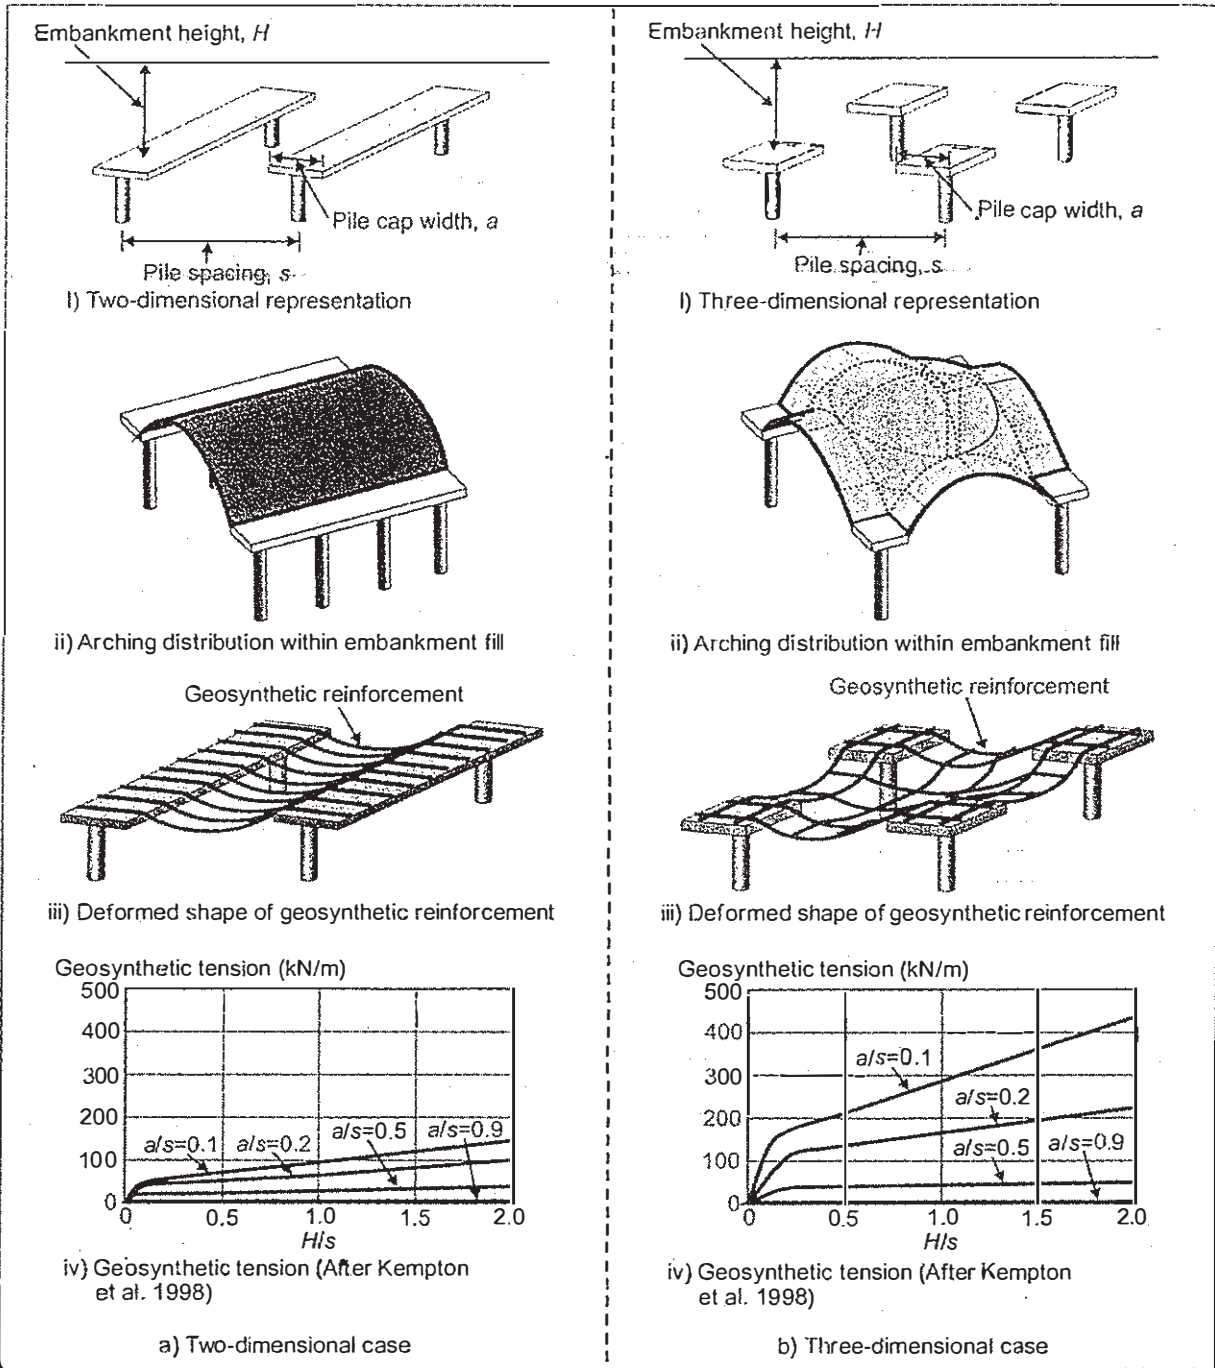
Effect of pile group layout on embankment arching and resulting reinforcement loads.
